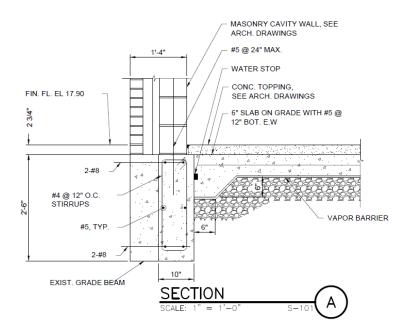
Section (A) 10" Grade Beam-Proposed Design
